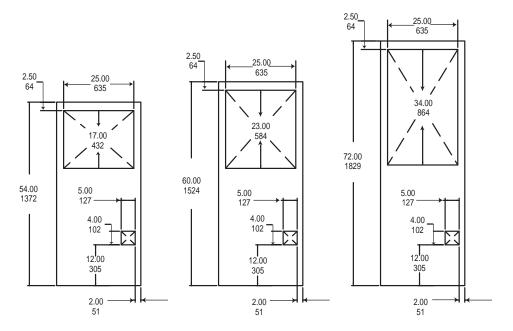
Bottom Conduit Entrance-Auxiliary Section (30-inch wide)
